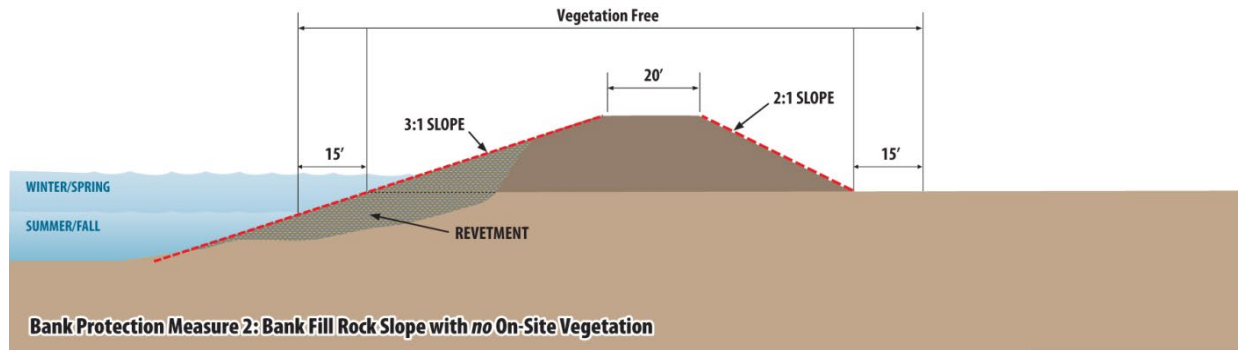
Measure 2 Bank Fill Stone Protection with No On-Site Vegetation
